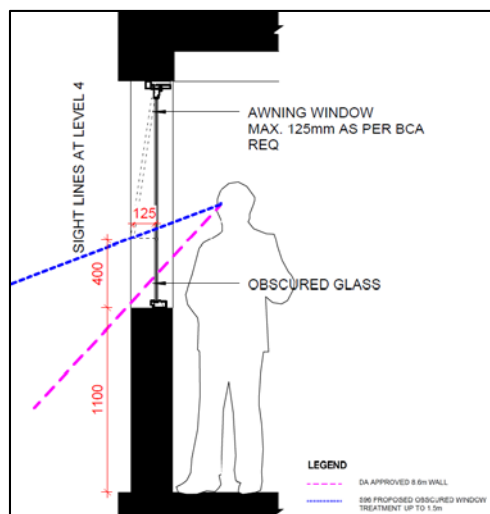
Privacy Window Treatment Details to southern windows of Level 4
